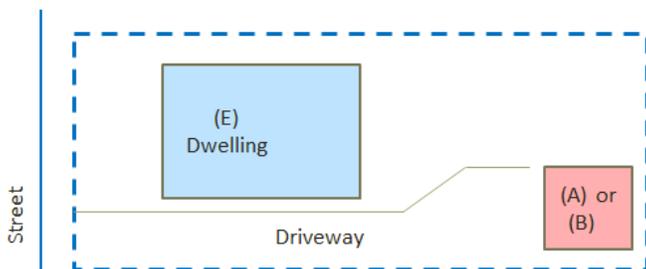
Convert existing garage to an ADU (A) or construct above existing garage (B).
